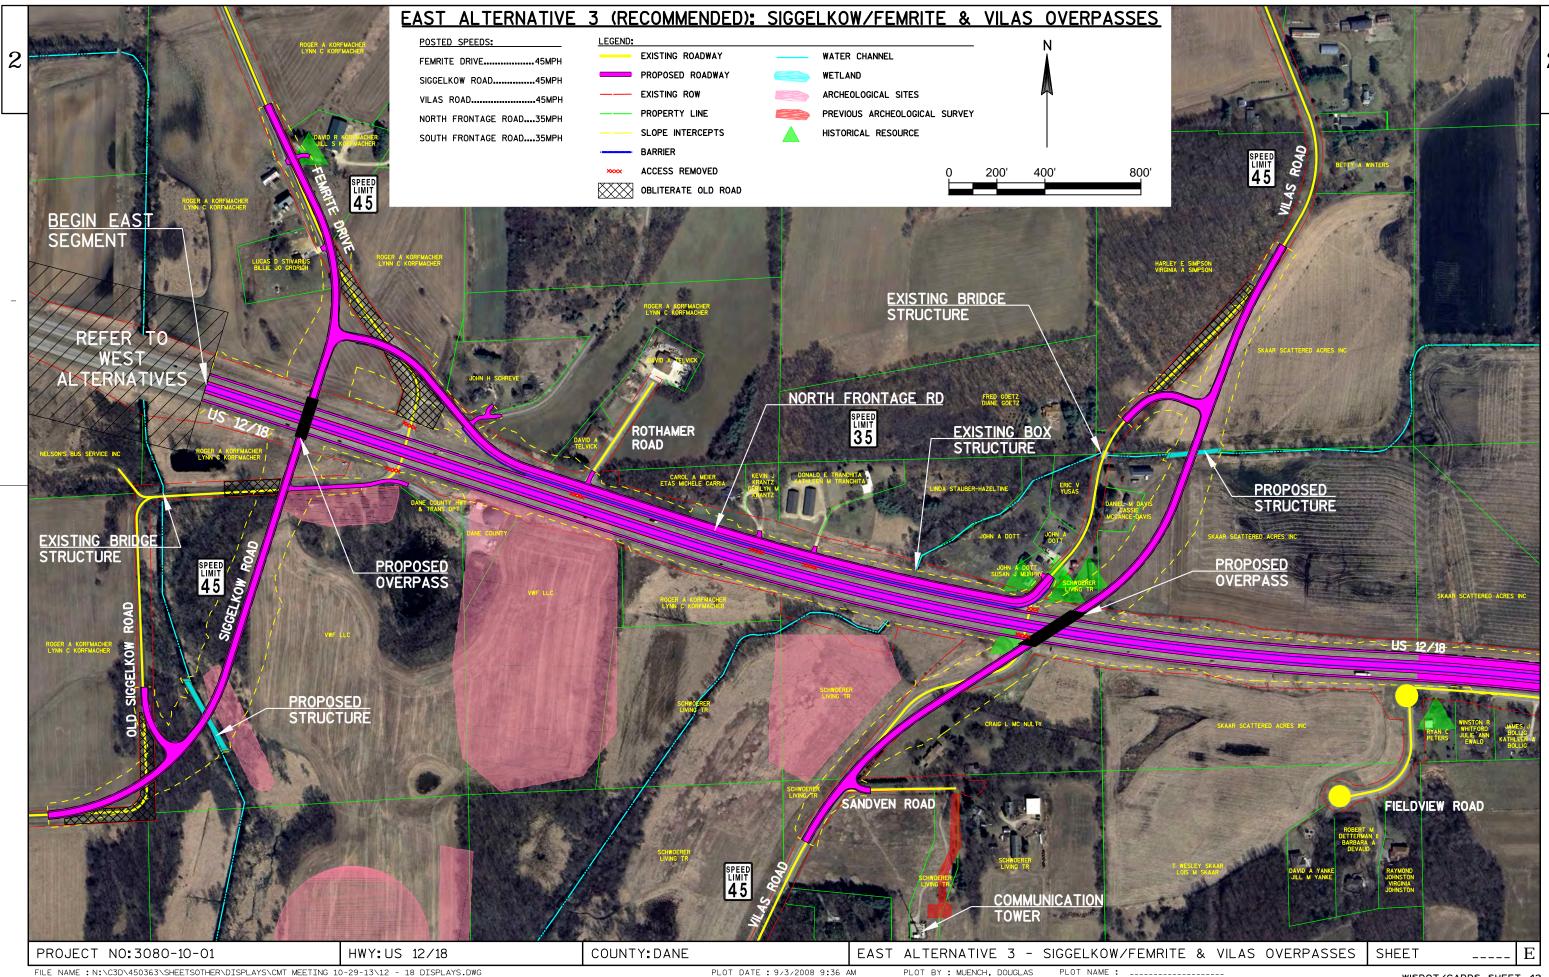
EAST RECOMMENDED ALTERNATIVE & TYPICAL SECTIONS
